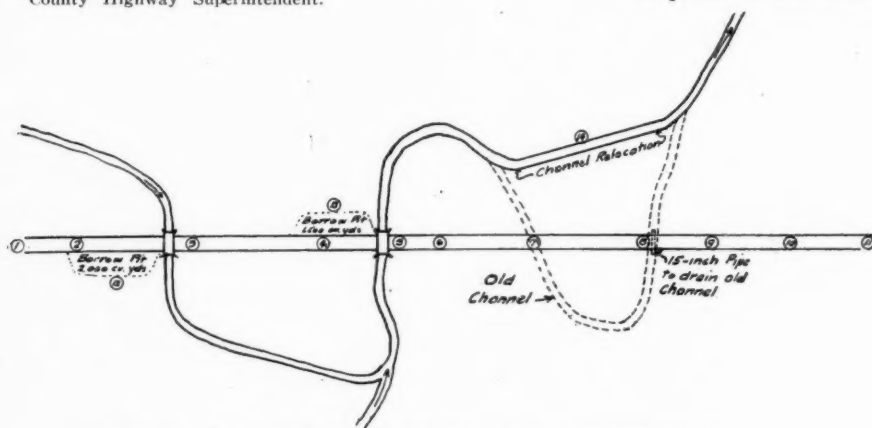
GENERAL PLAN OF DAVISON COUNTY ROAD.
